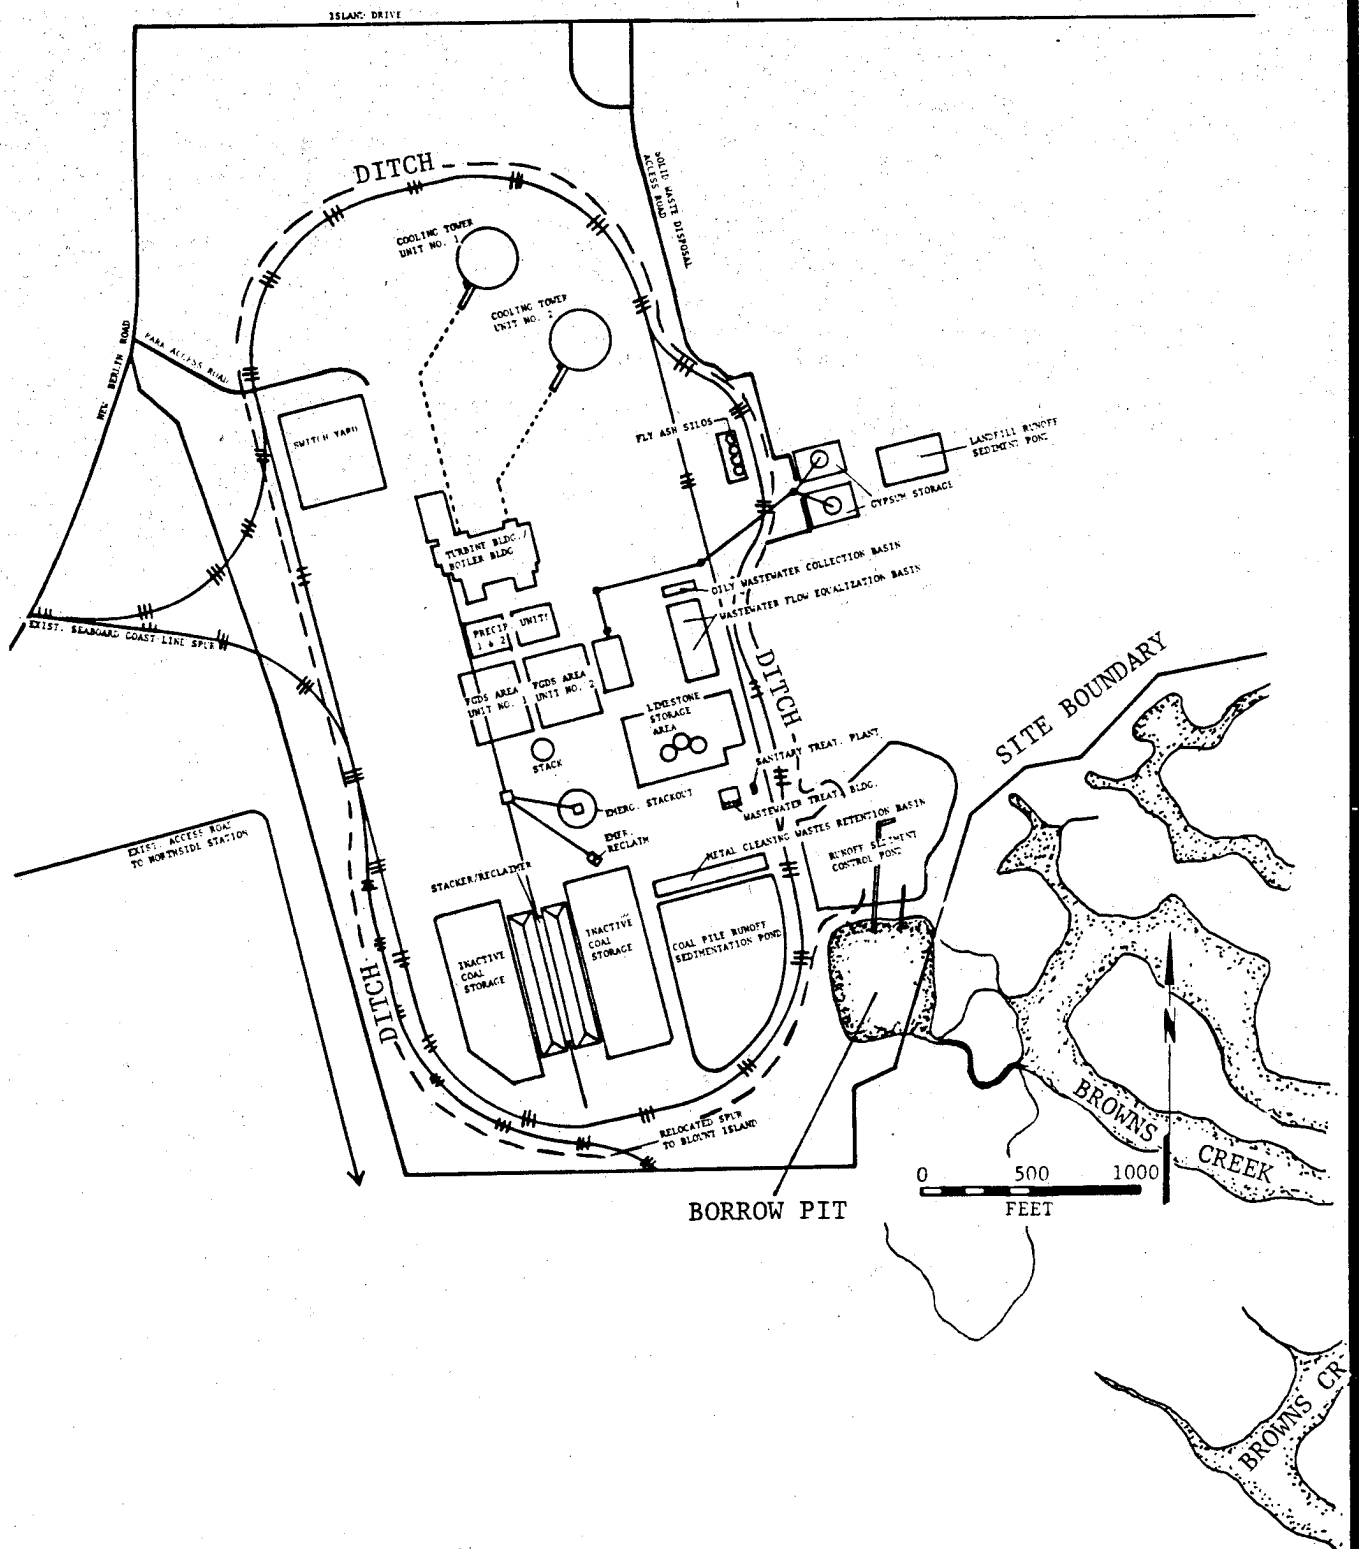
Construction Phase Drainage-Plot Plan
